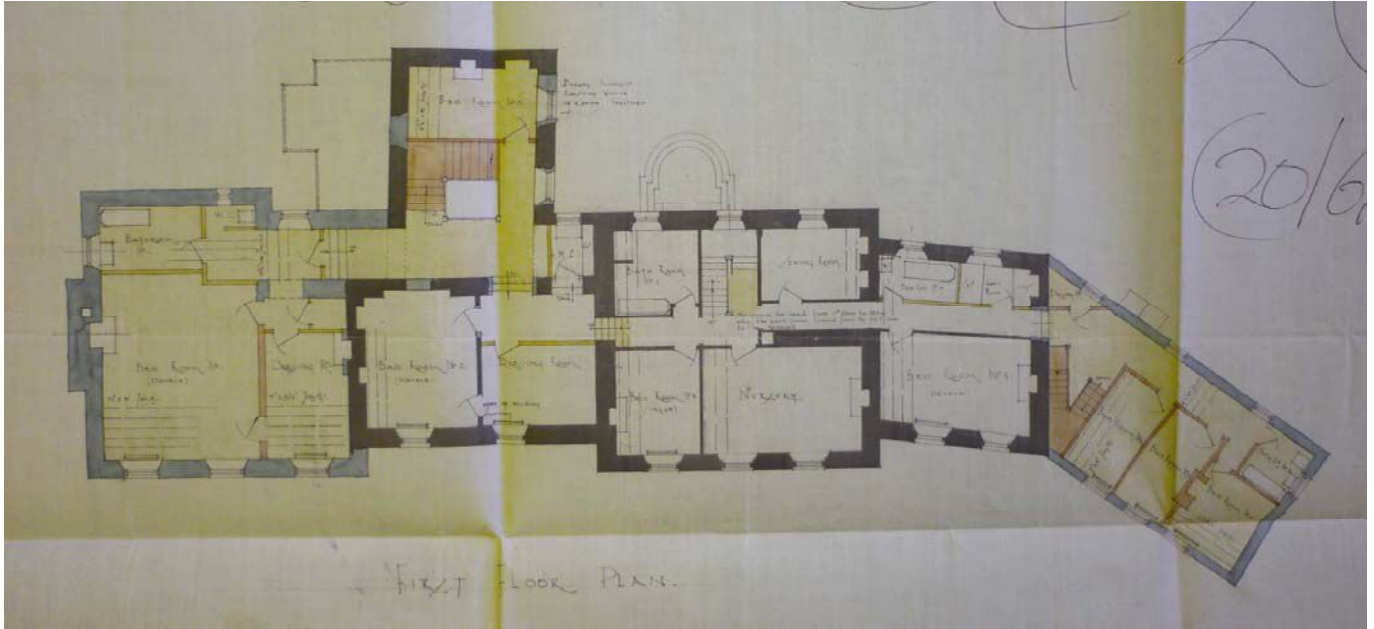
First floor plan dated 1925 showing extensions to the house and alterations (in blue)
